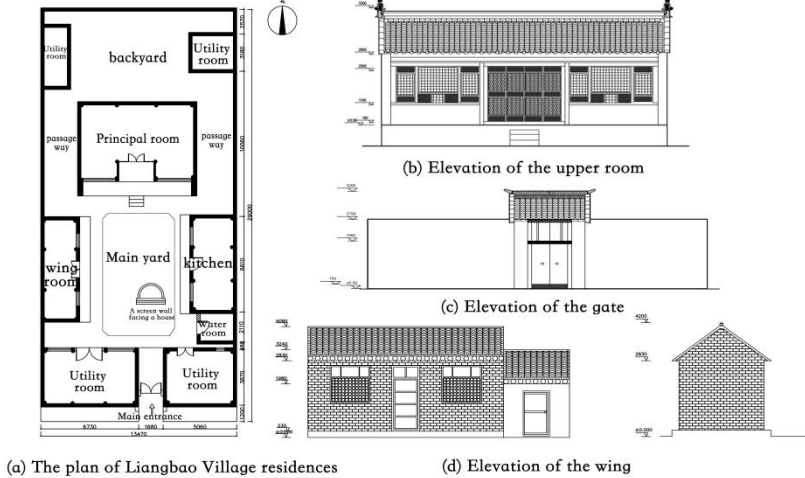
The plan and elevation of the folk houses in Liangbao village.
